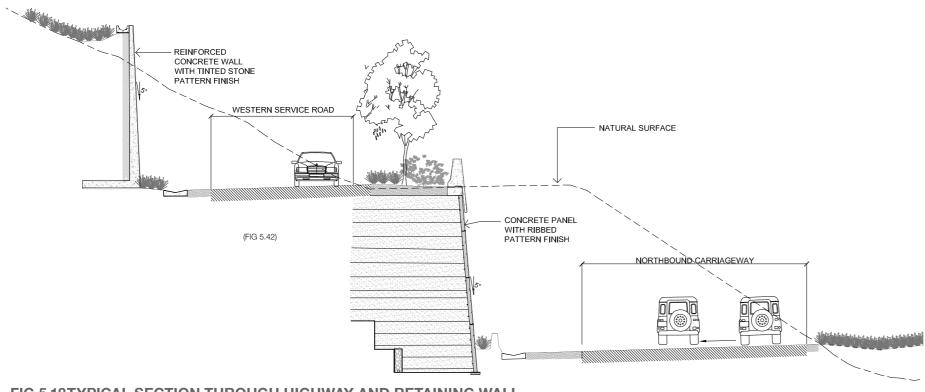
TYPICAL SECTION THROUGH HIGHWAY AND RETAINING WALL
